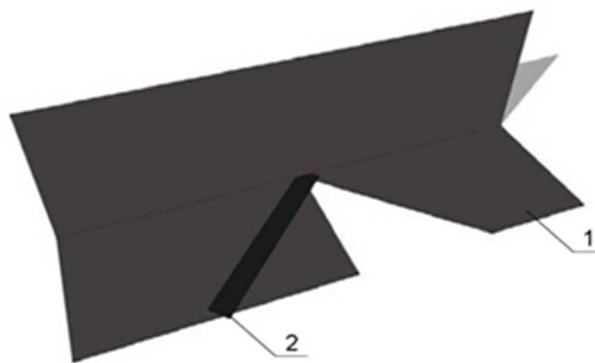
HOT AIR LONGITUDINAL JOINT OF MEMBRANE STRIPS – CROSS-SECTION
